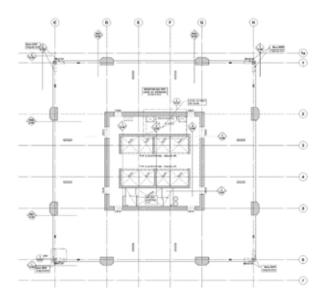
Typical floor plan above the retail levels showing the core that was transferred
